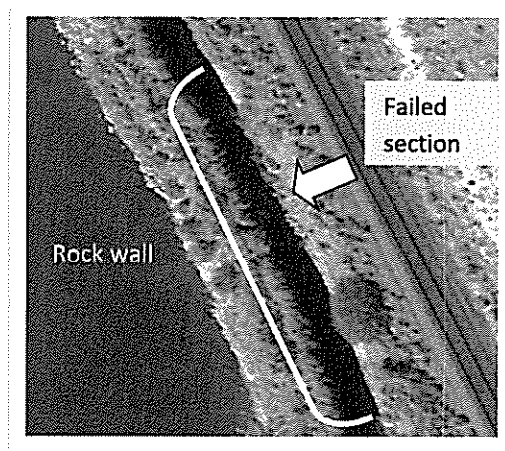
Aerial view of 200 In ft. rock reinforced wall and failed section.
